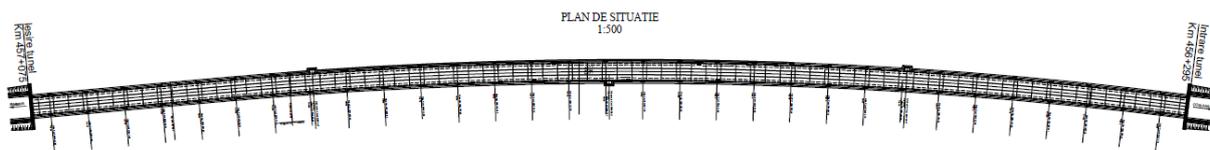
Plan view – Turdas tunnel <sup>[3]</sup>
